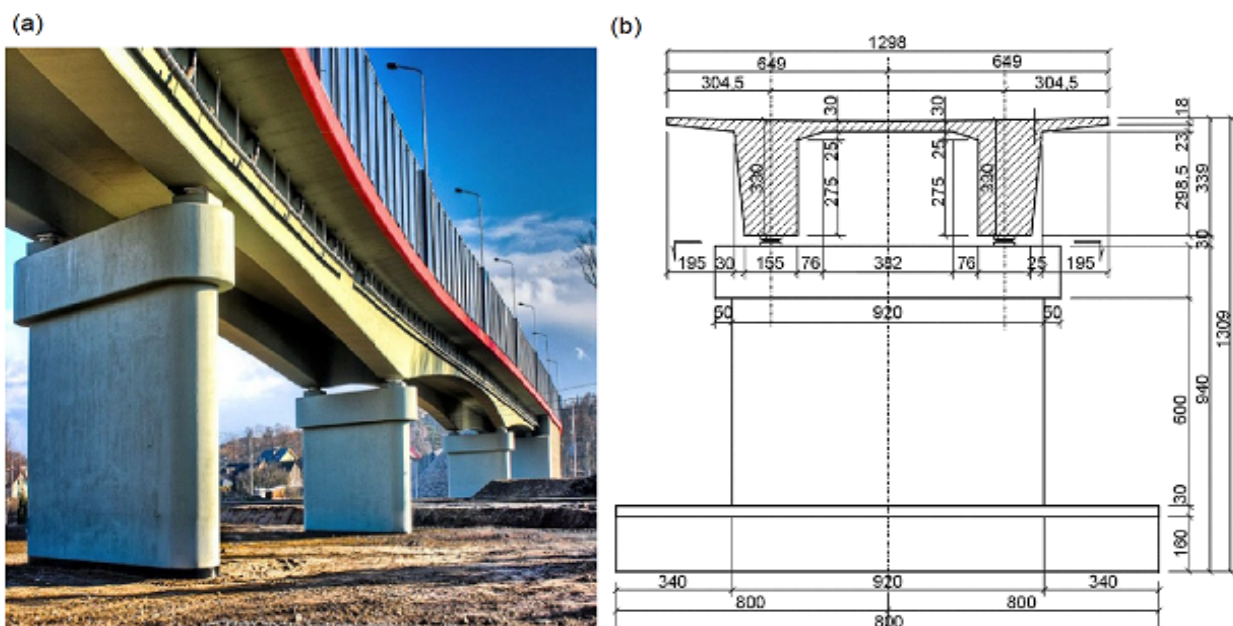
The general view (a) and geometry of the cross section the central pier of the viaduct (b)
